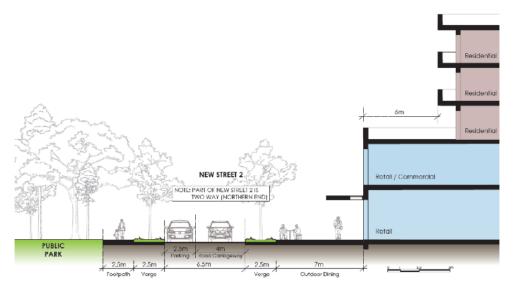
Figure: New Street 2 Setbacks – Southern End (Section B-B)
